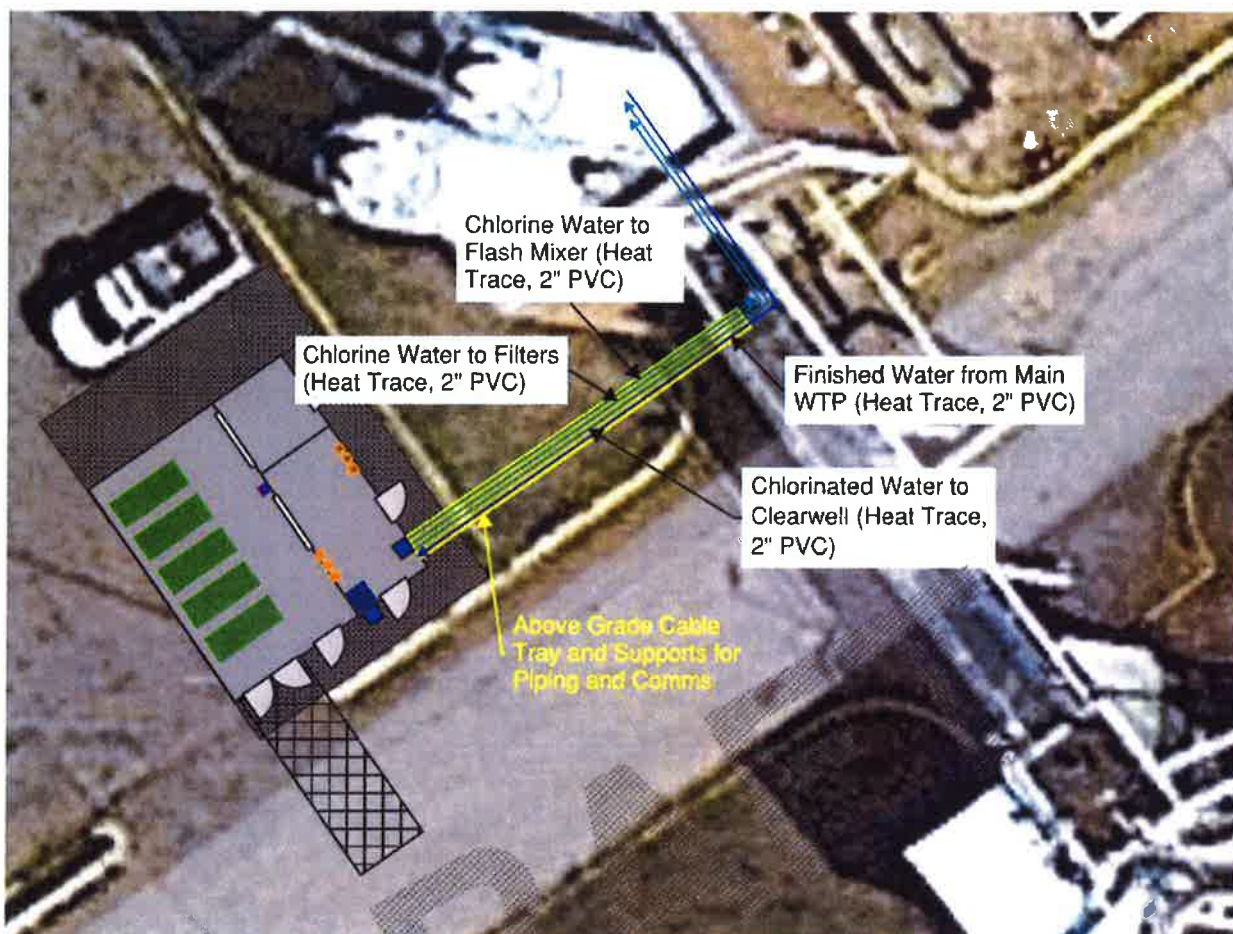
Site Plan (General Connectivity) Piping Layout
